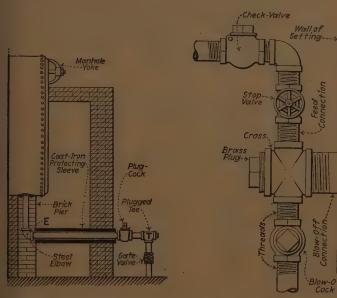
Blow-off apparatus of a return-tubular boiler.
